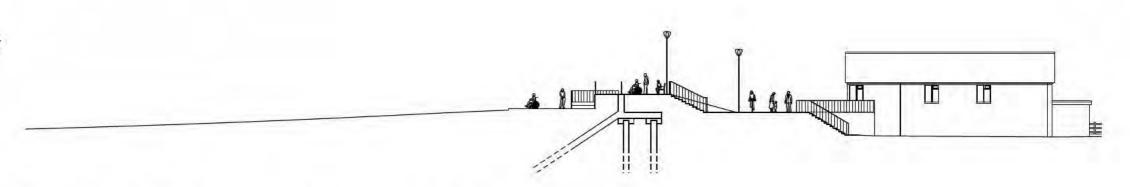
Option B - indicative section through beach and sea wall at the Village.
